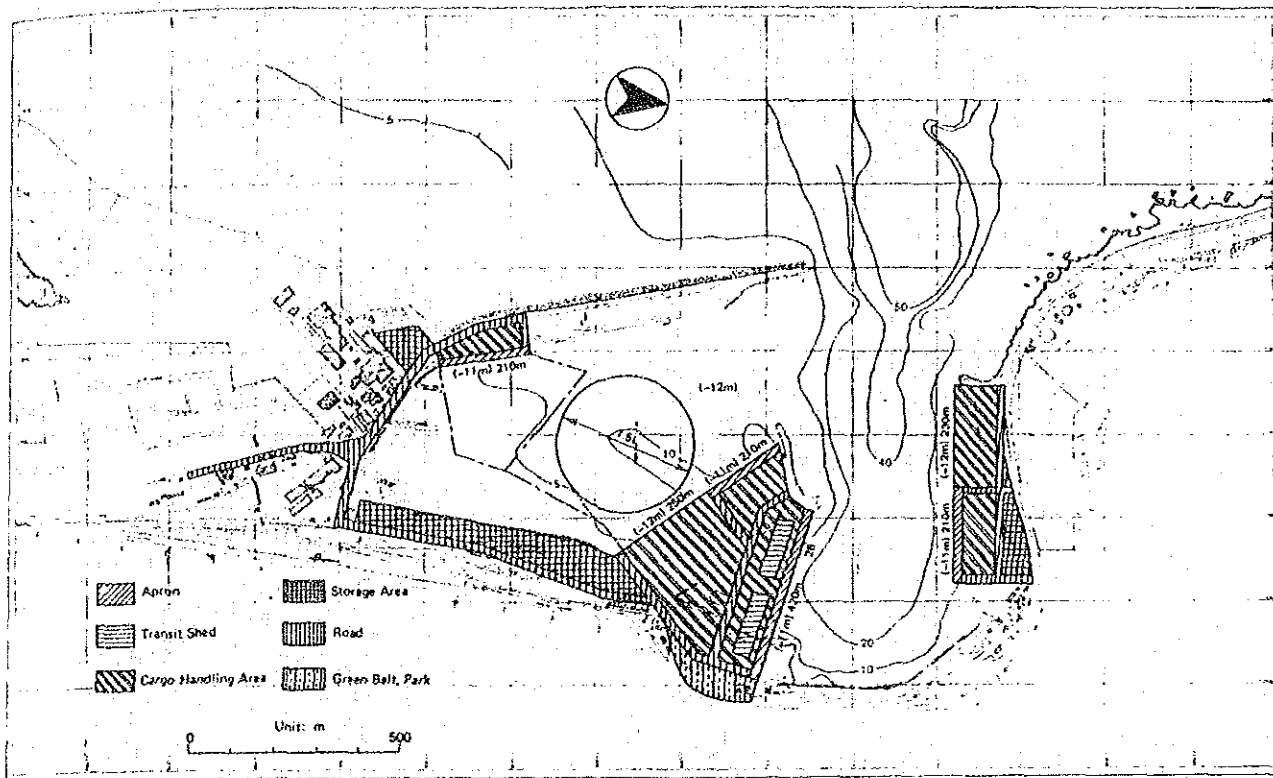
Master Plan of San Antonio Port (2010) Plan C
